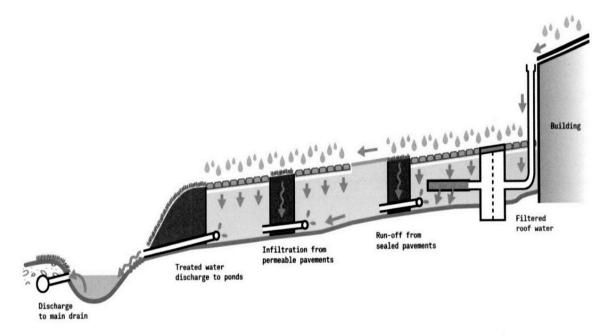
Concrete Blocks Permeable Pavement [9]
